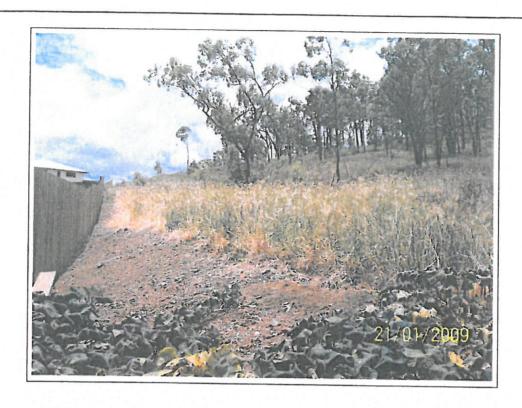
SITE LOOKING ALONG WESTERN BOUNDARY WITH STAGE 1, LOOKING NORTH WEST
